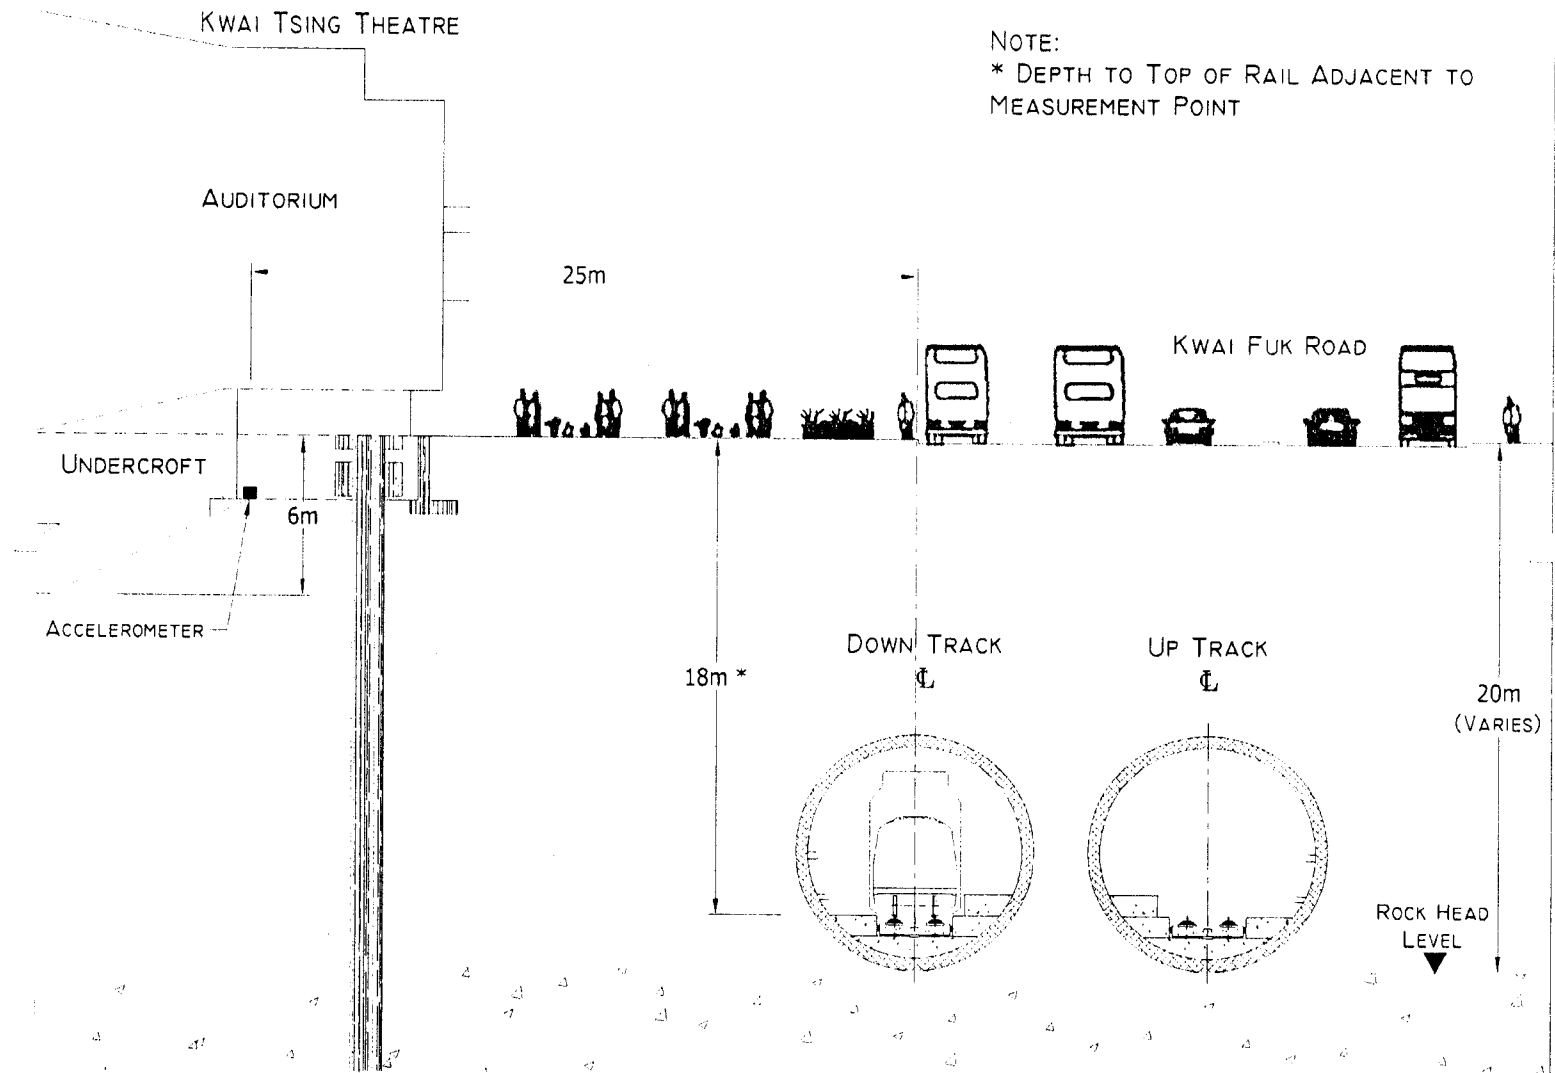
B SCHEMATIC SECTION OF THE TUNNEL ALIGNMENT ADJACENT TO KWAI TSING THEATRE
